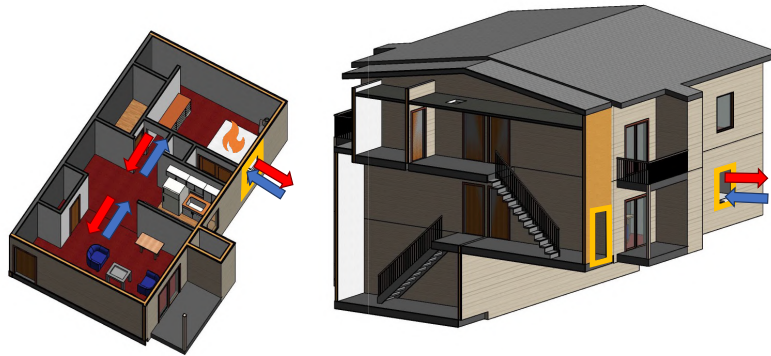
Image of hydraulic ventilation from the bedroom (fire room) window in Experiment 1D.
